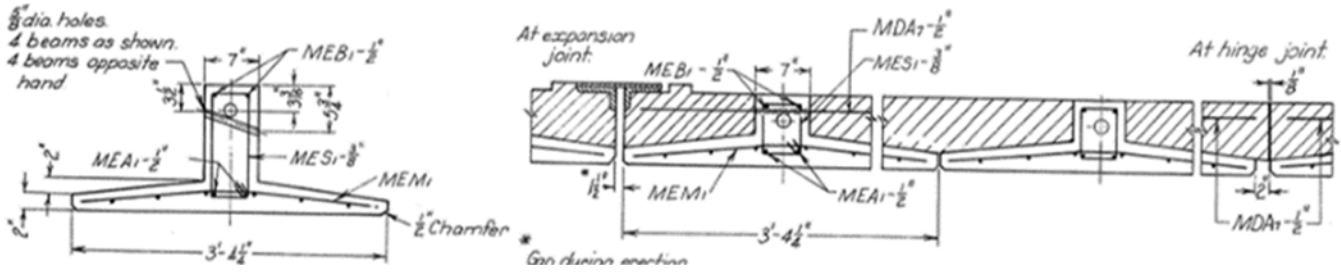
Deck cantilever precast segments and in-situ concrete fill [6]
